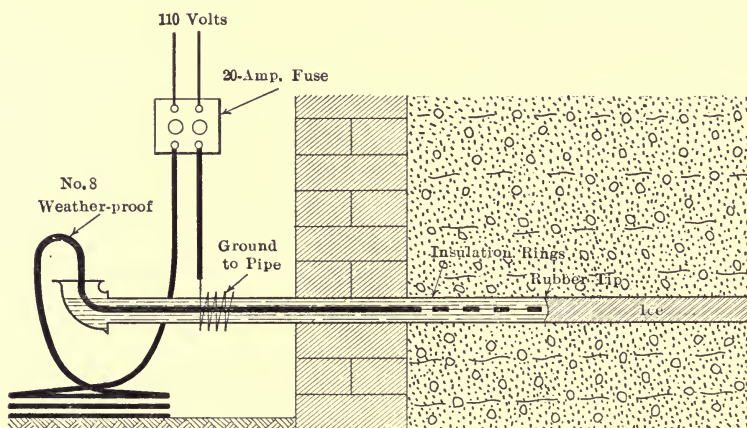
THAWING WATER PIPES WITHOUT A TRANSFORMER.
